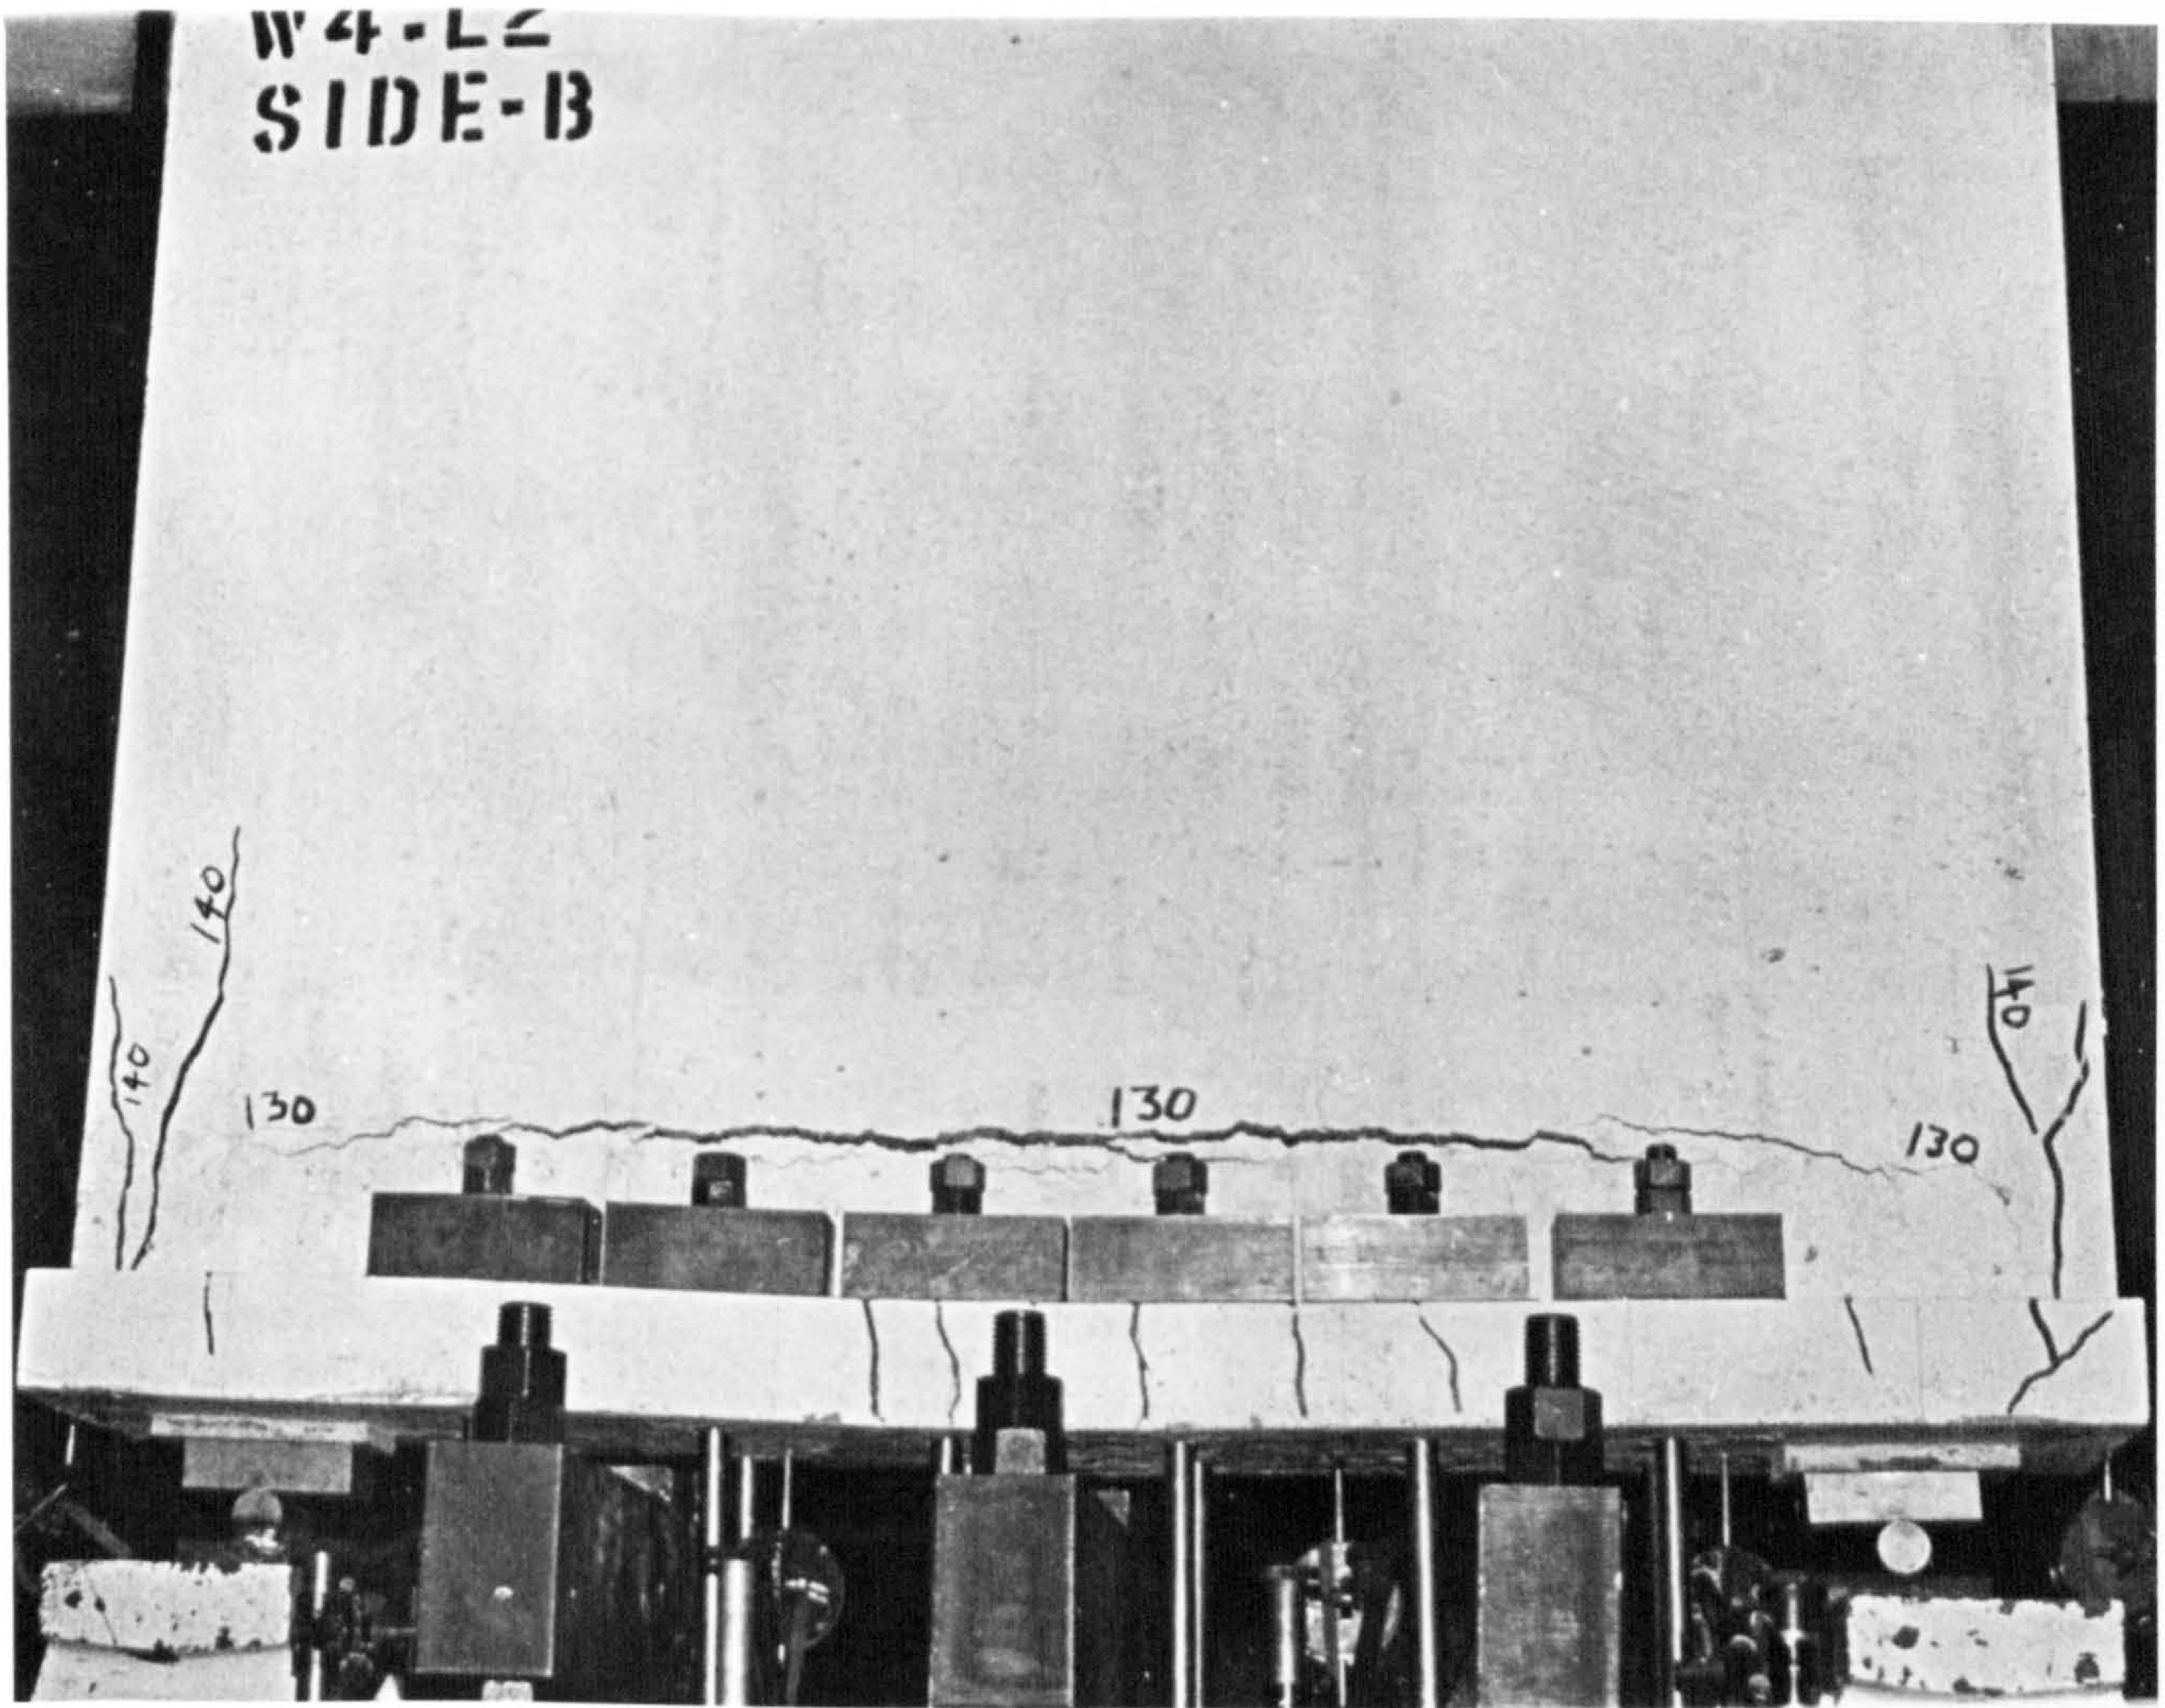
Crack pattern at a load of 140 kN for specimen W4-L2
